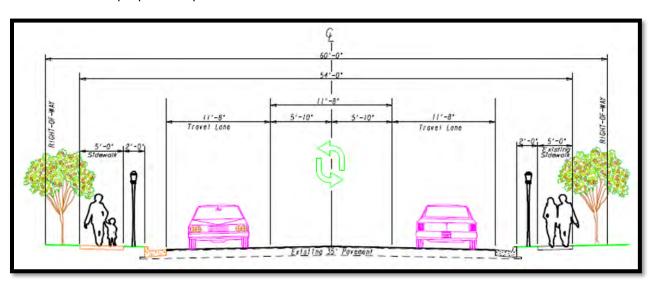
Proposed Typical Section – Alternative 1 – West First St. from Montgomery Ave. to Georgia Ave.
